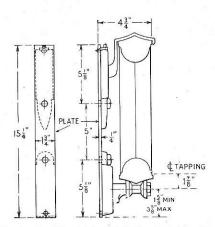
Arco Adjustable Wall Bracket, No. 1 Single. For all "A" Sections of AMERICAN Peerless Wall Radiators.
